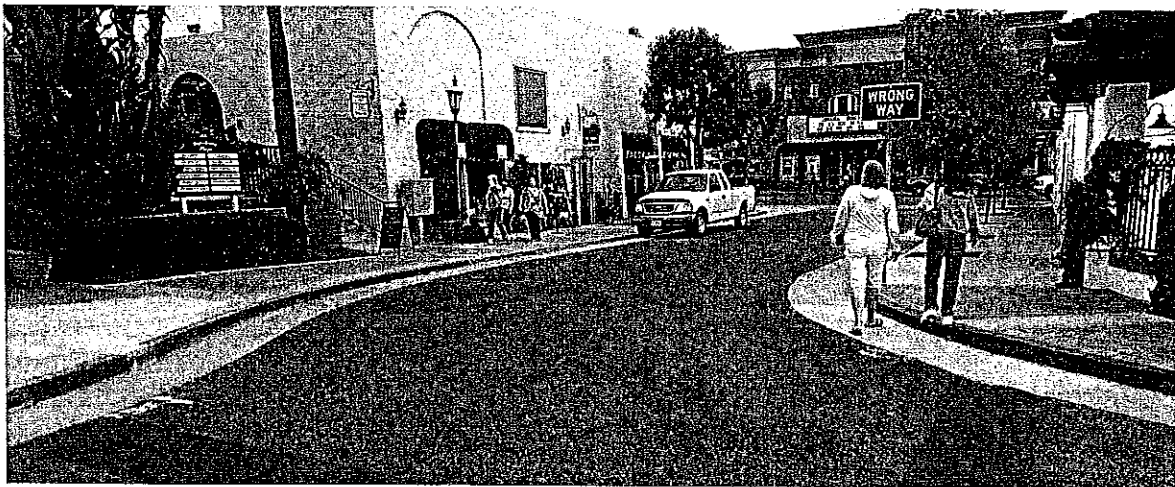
Photo showing Metrolink Station Parking Lot (part of pavement evaluation).
